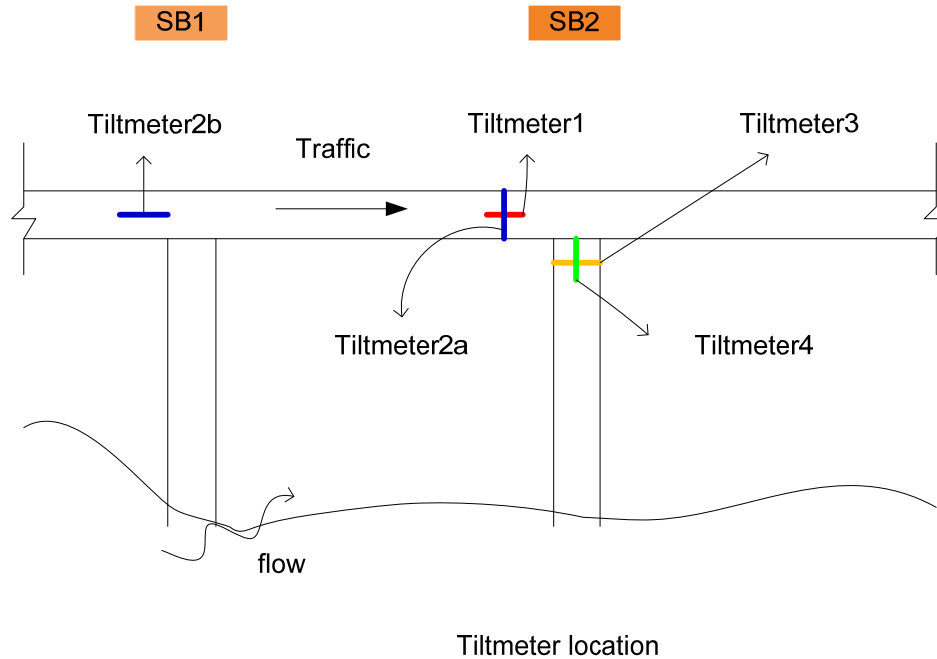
Layout of the Tiltmeter Location on US59 over Guadalupe River Bridge.
